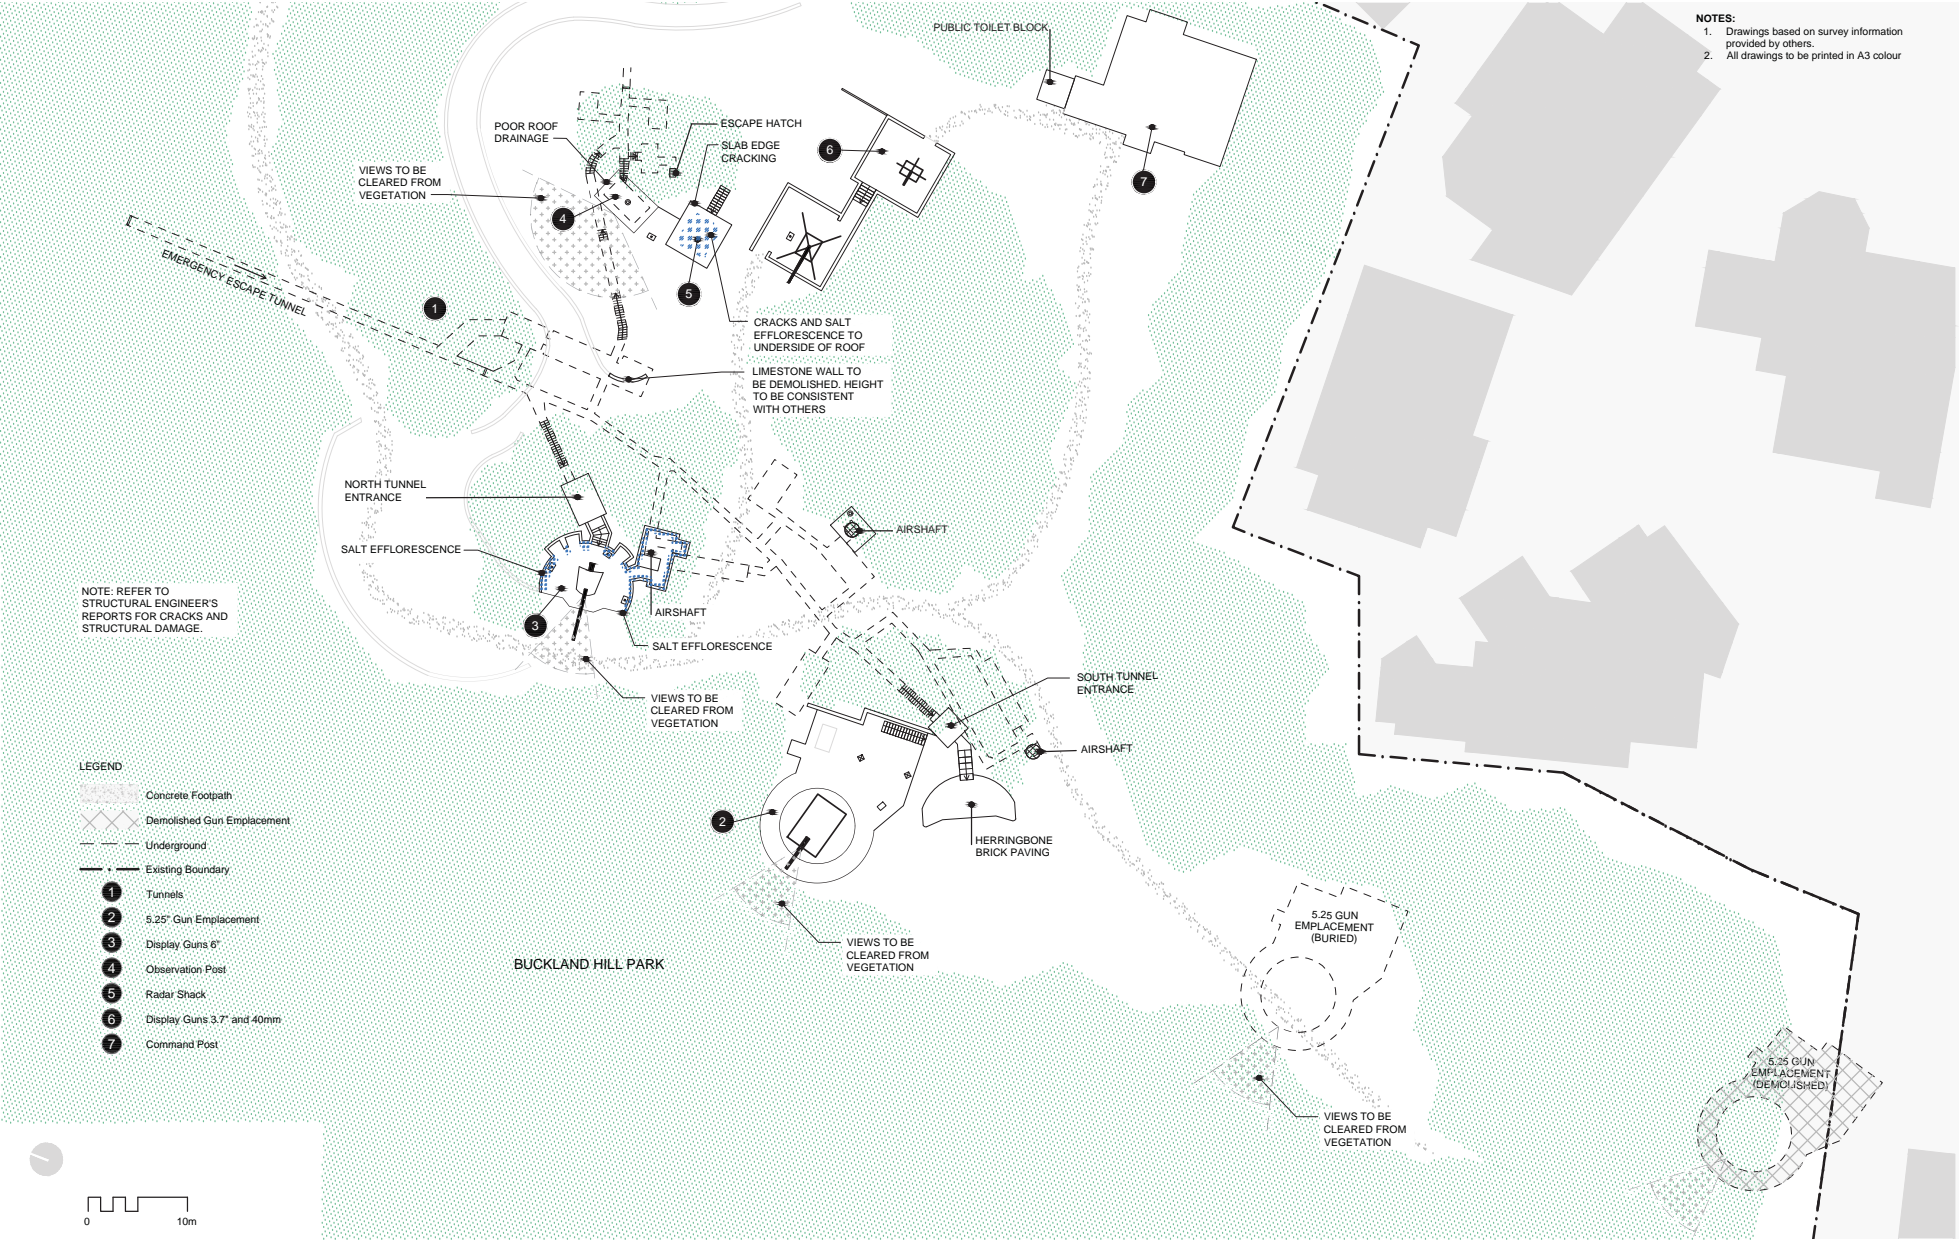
Site Plan Overall Condition Plan (element, 2019)
